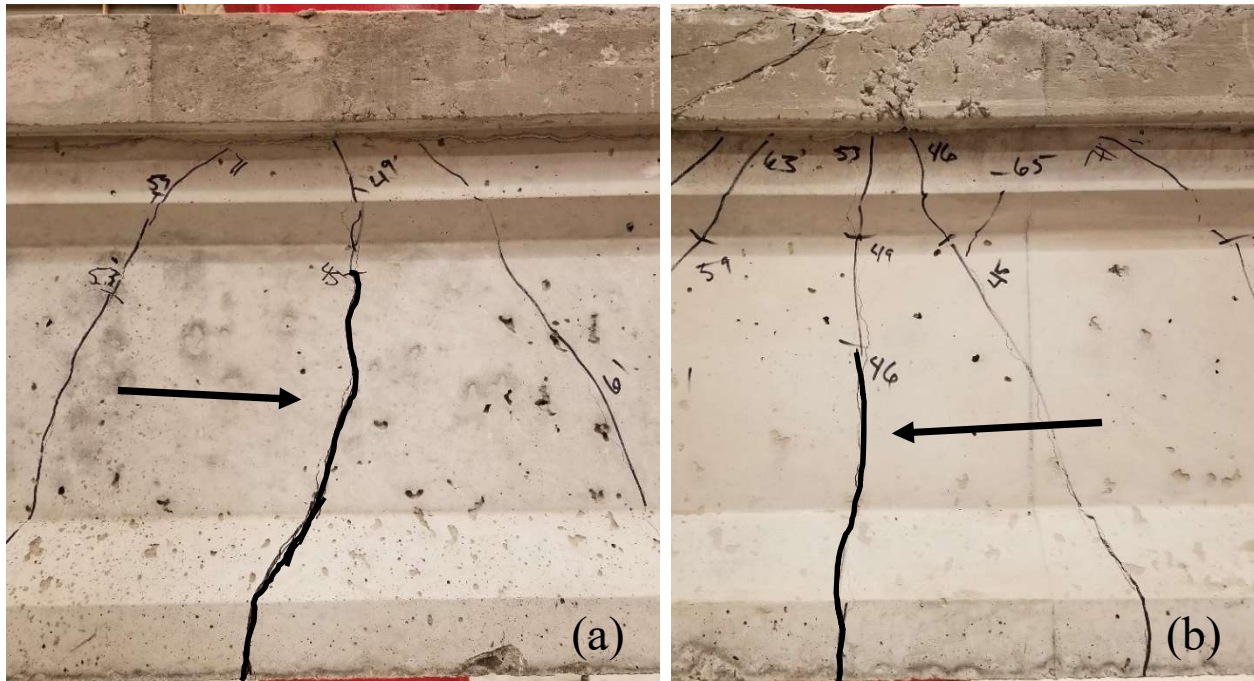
Initial flexural cracking under the load point on the RC3-N girder at 45 kips of load (a) and initial flexural cracking under the load point on the RC3-S girder at 46 kips of load (b). Arrows point to the dark lines that indicate the initial flexural cracks.
